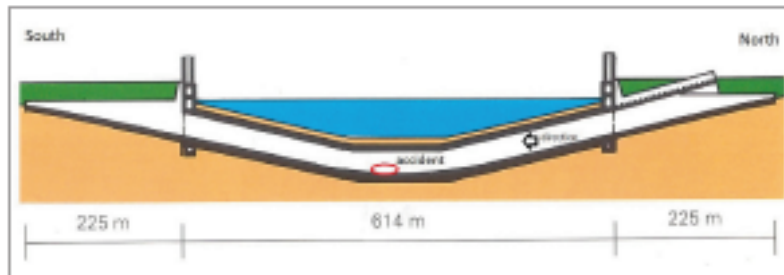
Longitudinal section (west tube) of the Heinevoord Road Tunnel
